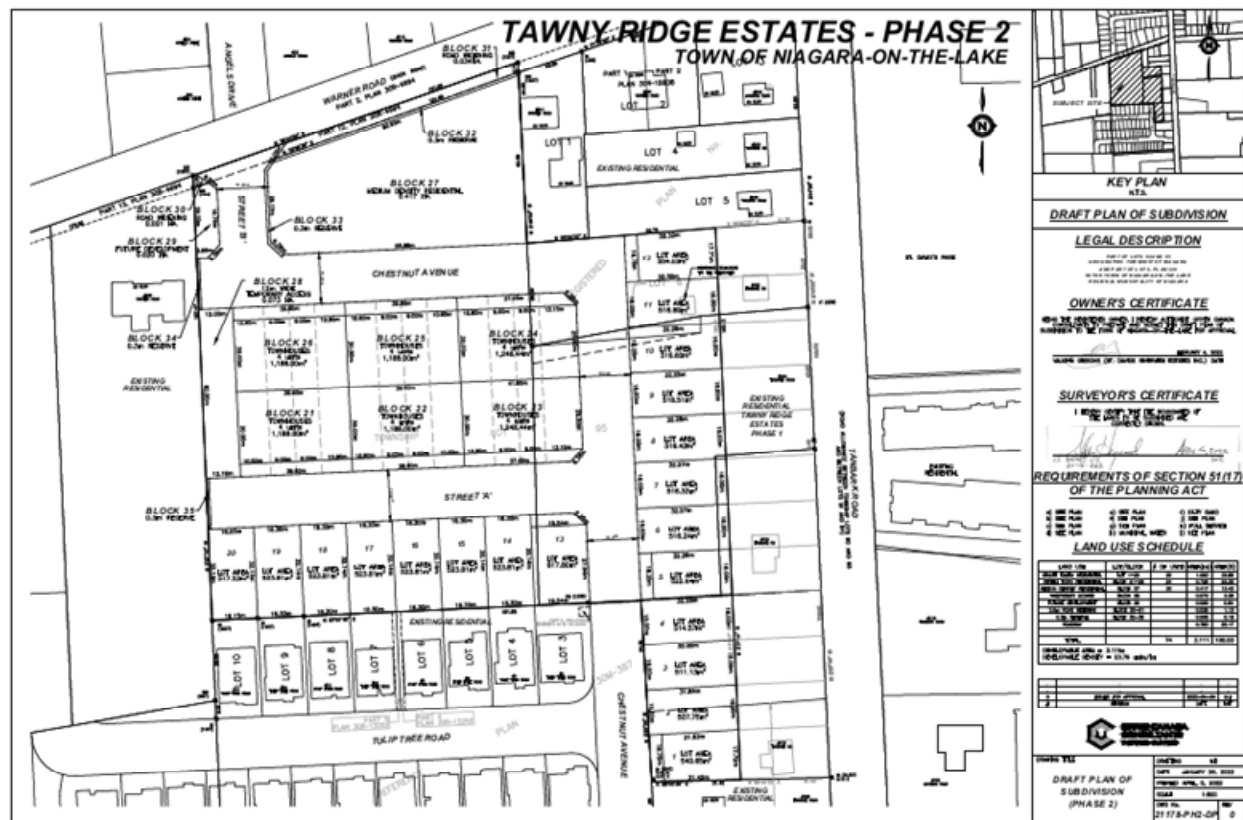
Draft Plan of Subdivision - Tawny Ridge Phase 2
